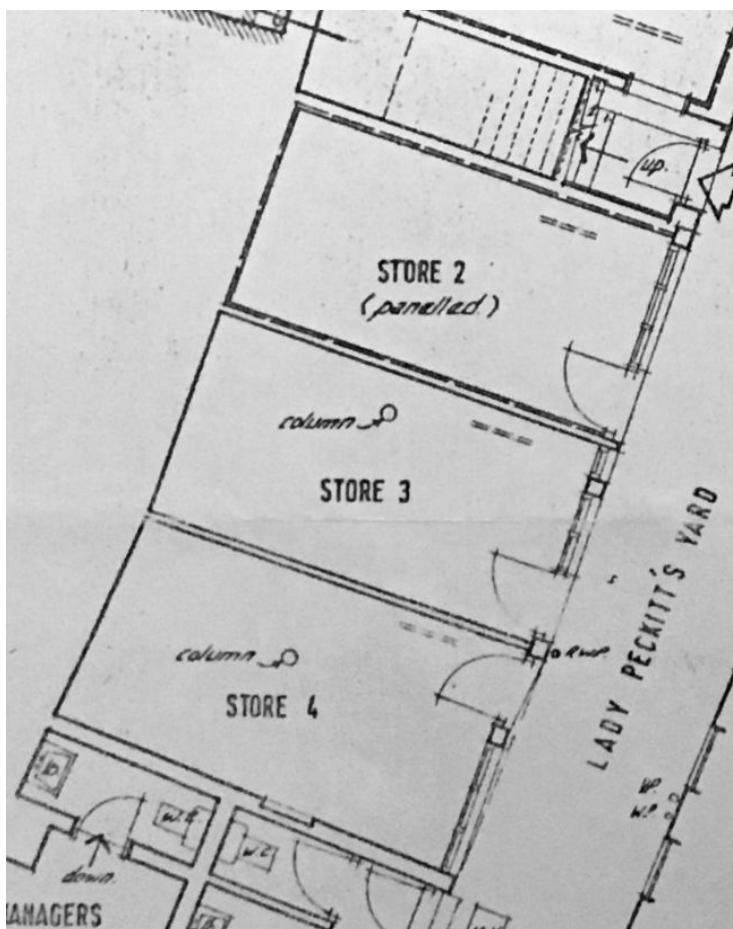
A plan of 1970 showing the division of the ground floor space into separate stores, accessed from Lady Peckett's Yard.
